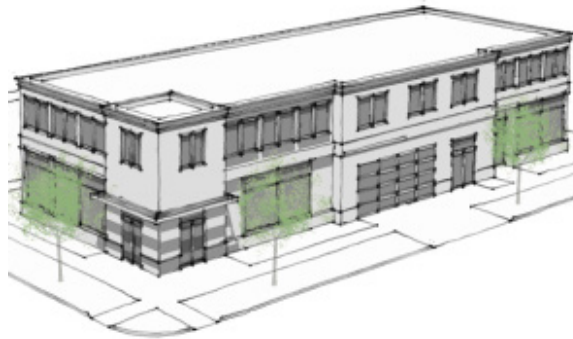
Limited bay building example with multiple entrances and entrance types
